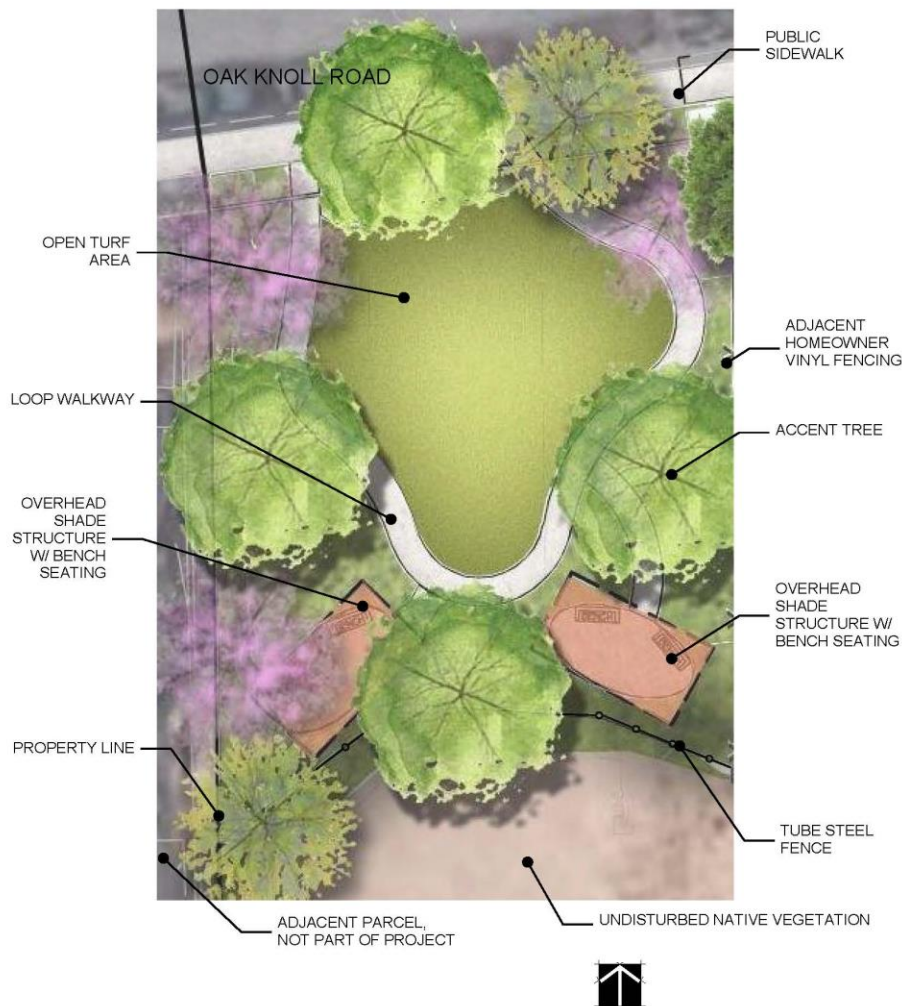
Poway Creek Overlook (OSR-1) Conceptual Plan
